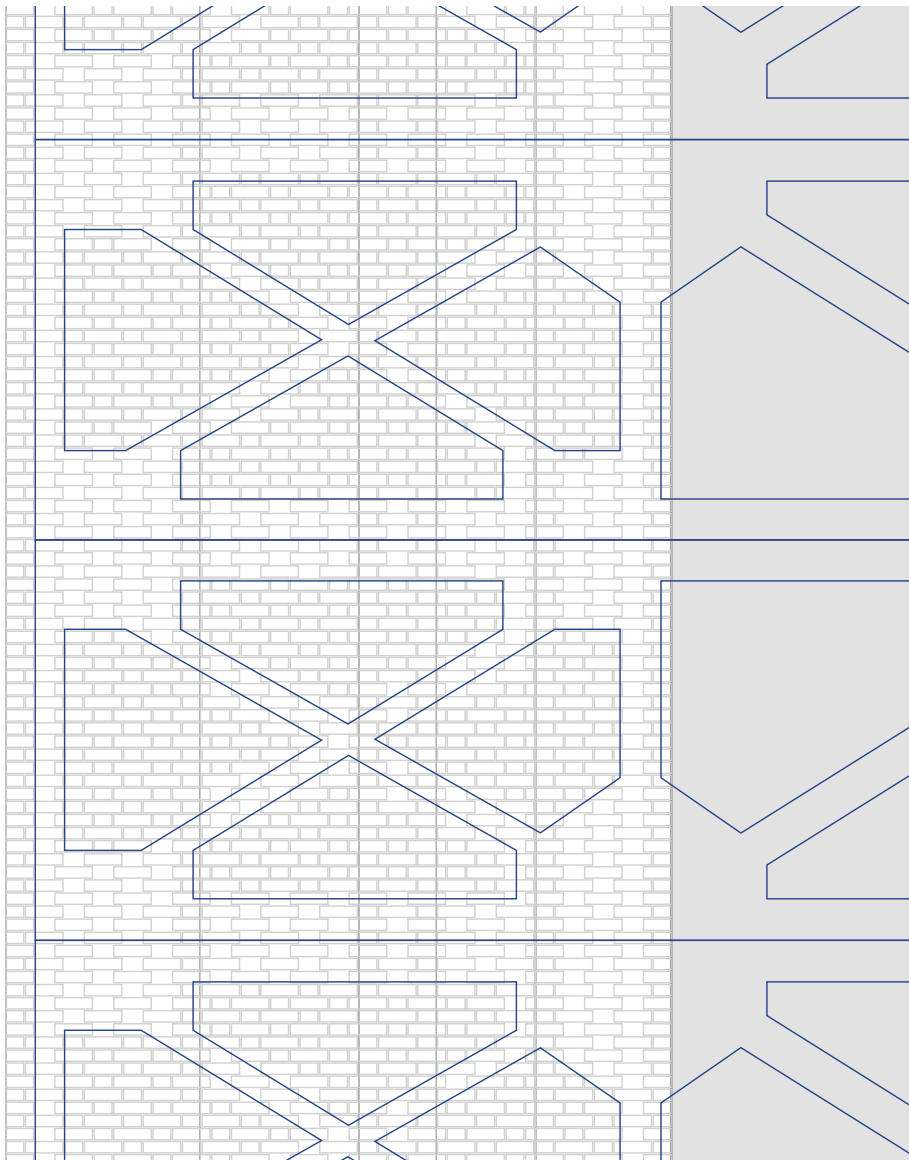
Linework overlaying the Leitch Truss pattern on the facade
